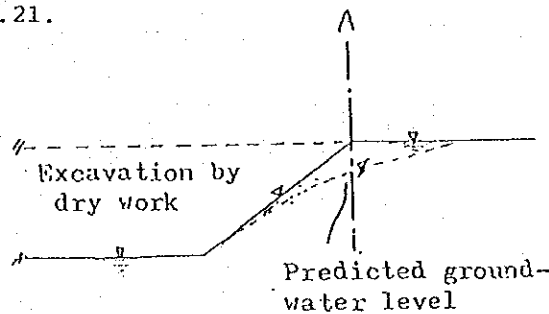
Water Level inside Testing Testing Canal Facility
